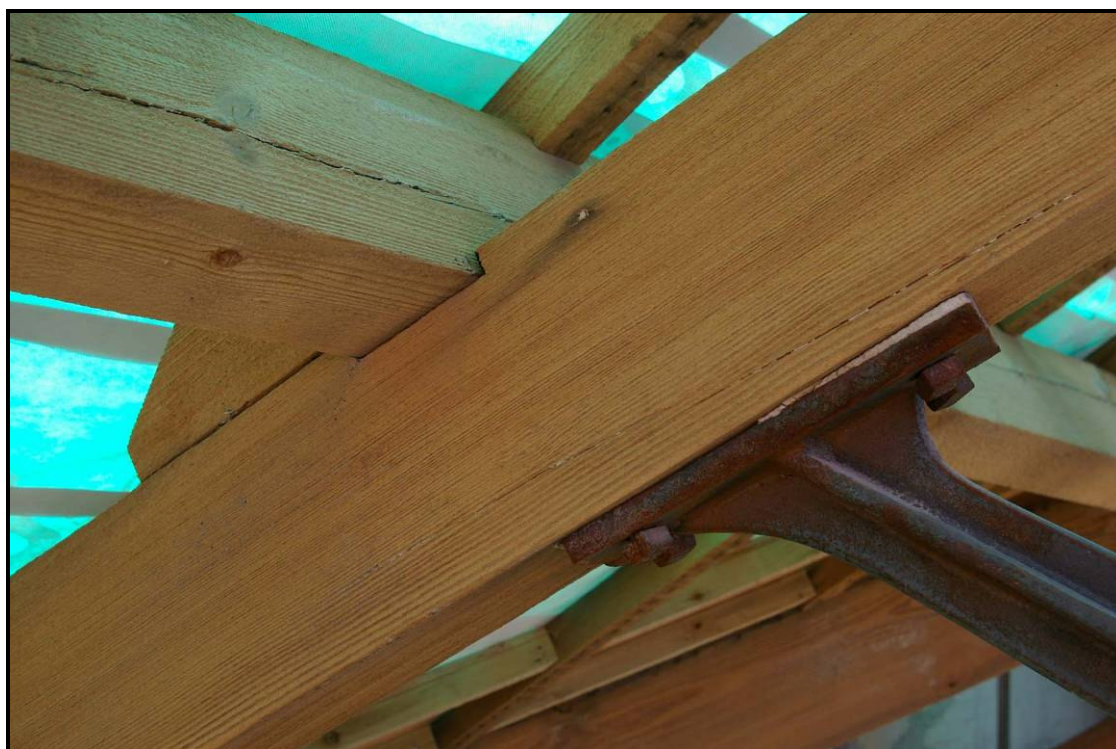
Detail of raking strut fixed on a principal rafter and trenched purlin supported by cleat
